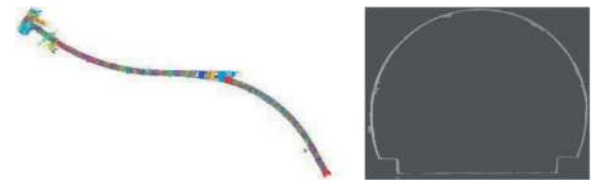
Tunnel point cloud model (left) and extracted typical cross section (right).
